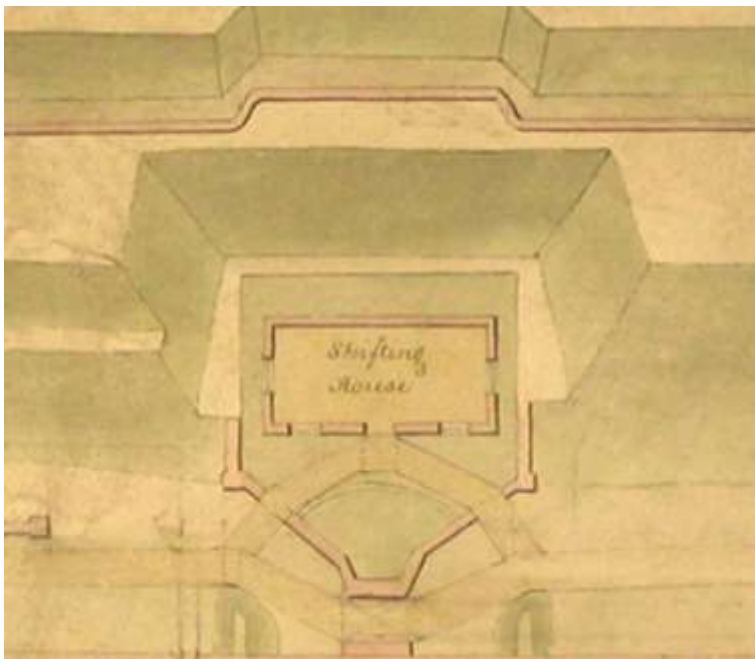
The Shifting House appears to have been rebuilt to slightly smaller dimensions after 1825 (Evans 2000b: 32)
